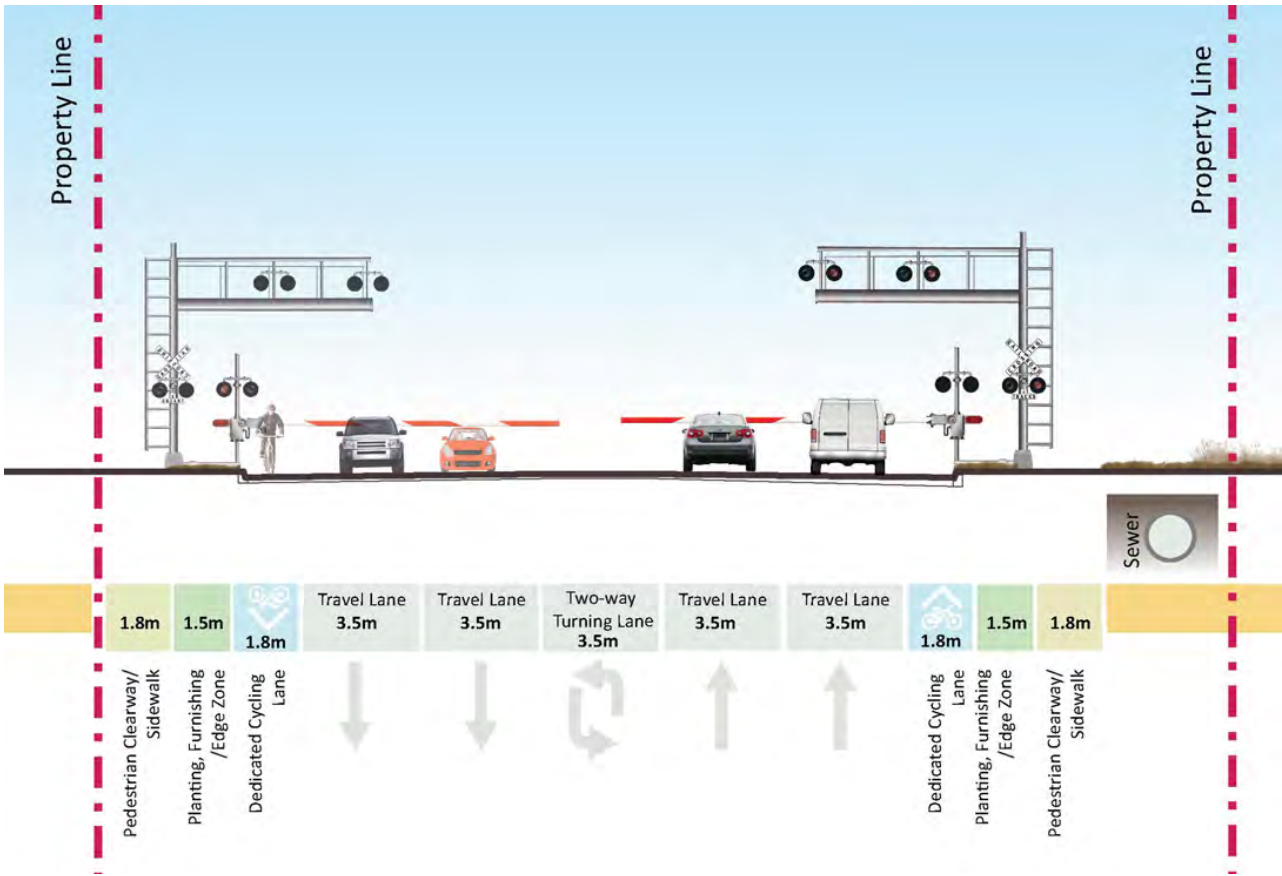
Cross Section of Alternative A – Improved At-Grade Crossing
